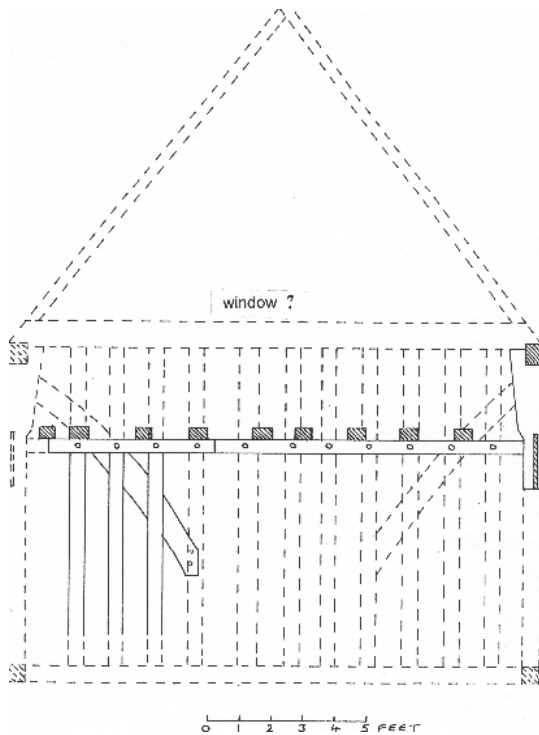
Butler's Farm, Wrabness, medieval hall house, end wall from inside
